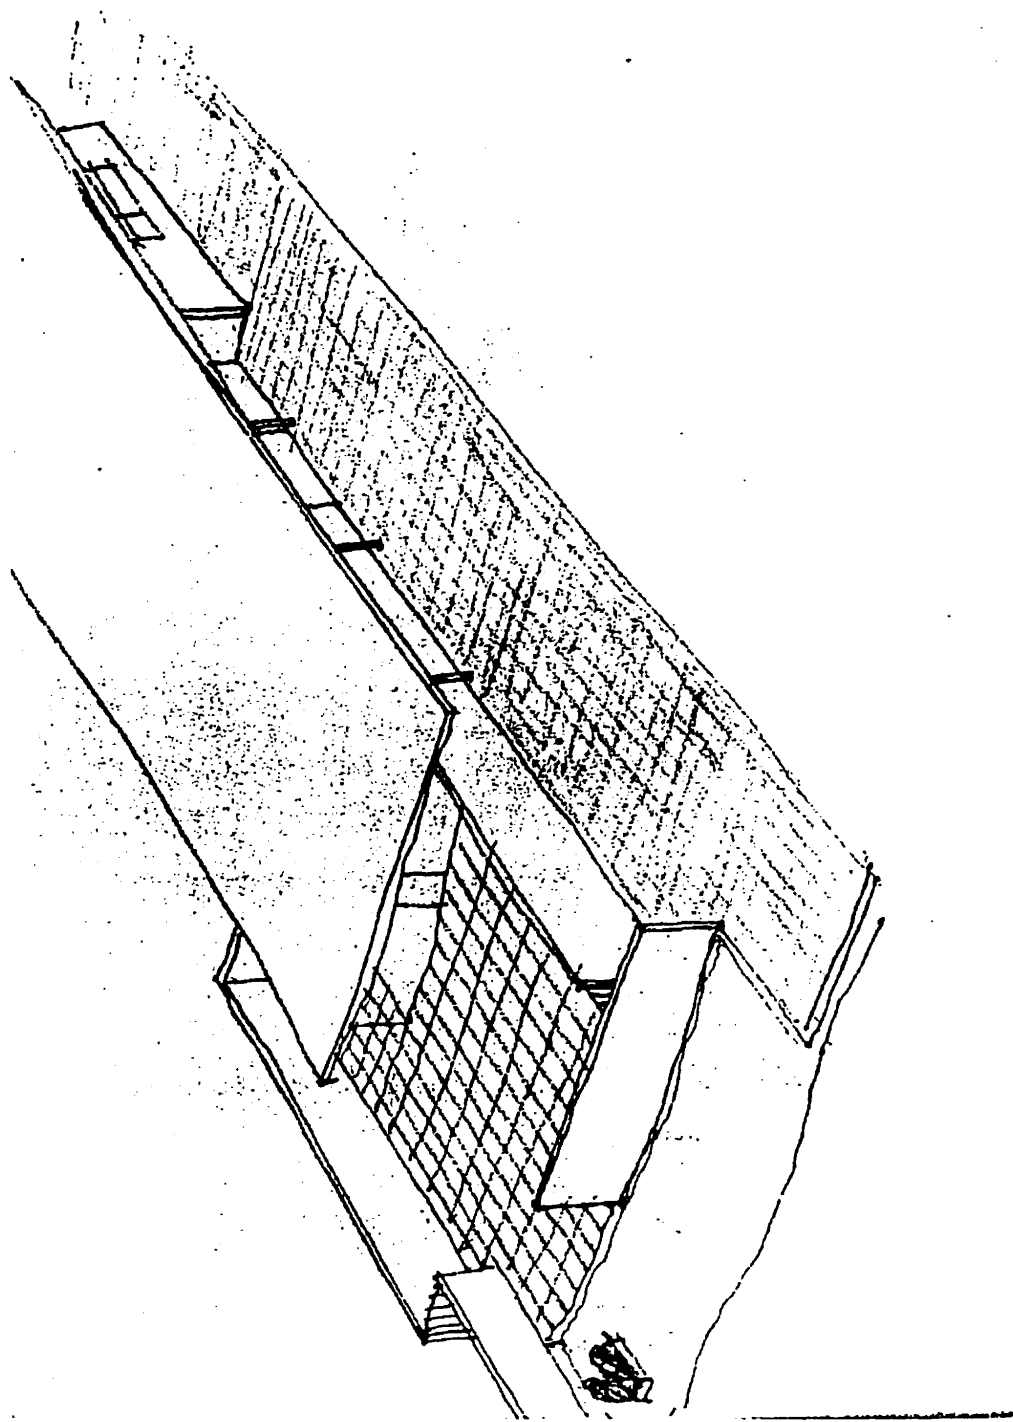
Aerial perspective, Model House at the Berlin Building Exposition.
